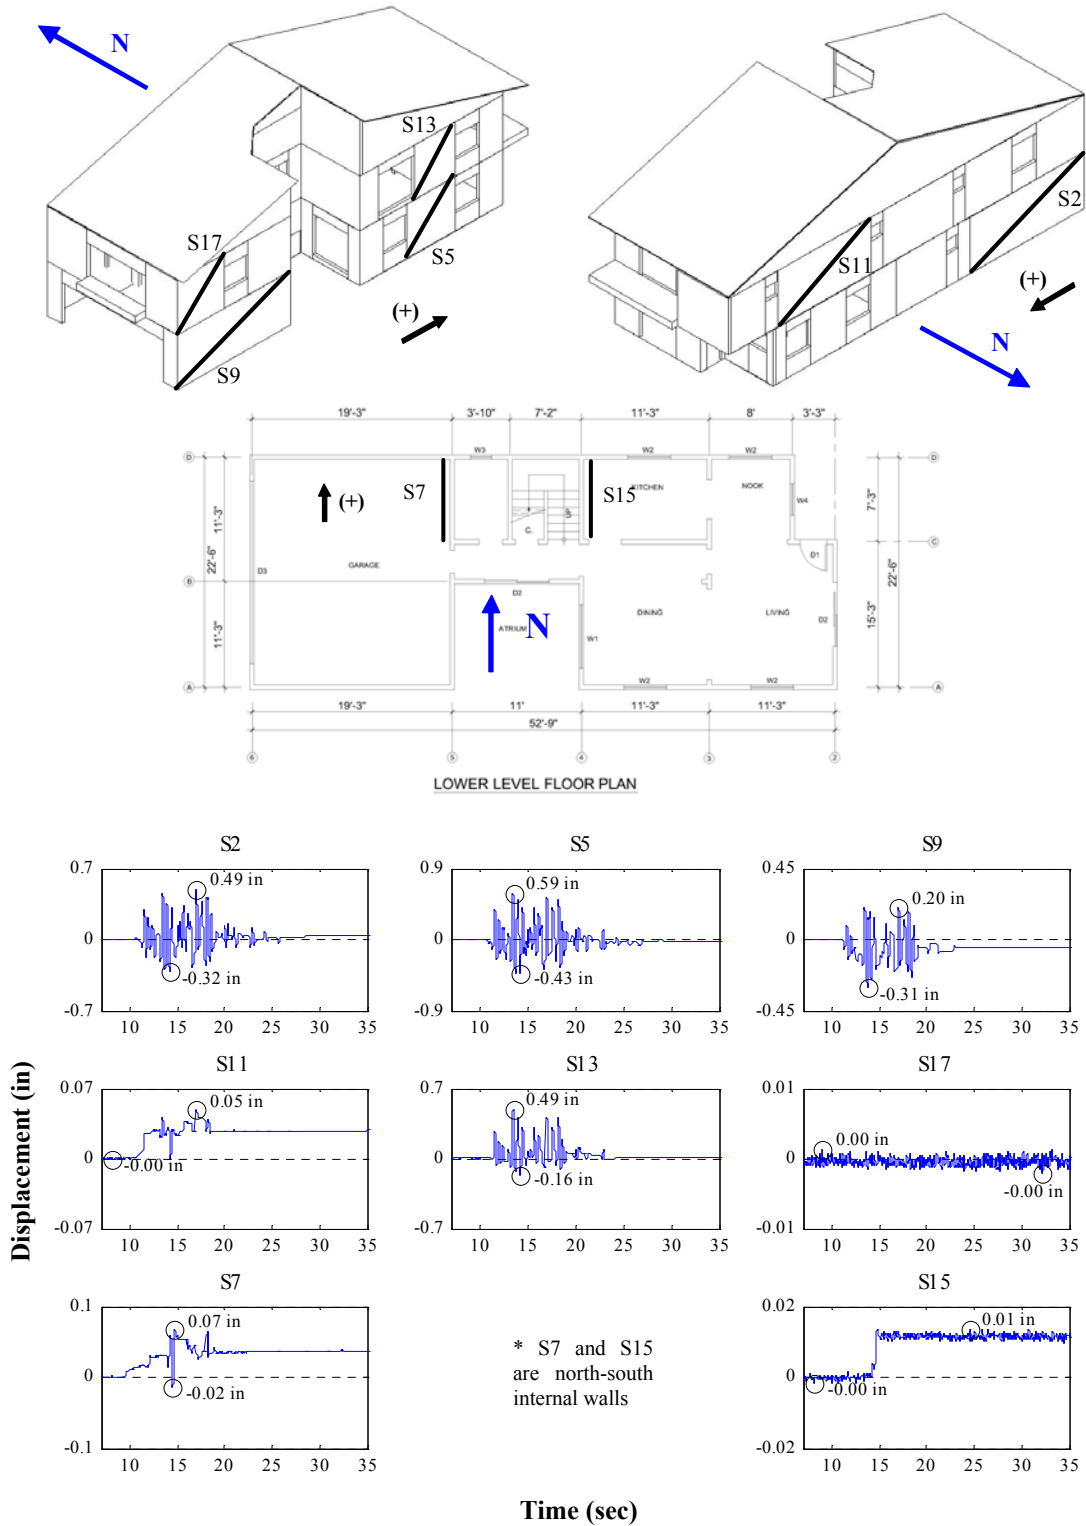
Wall deformations of east-west internal walls for Test NWP2S27
